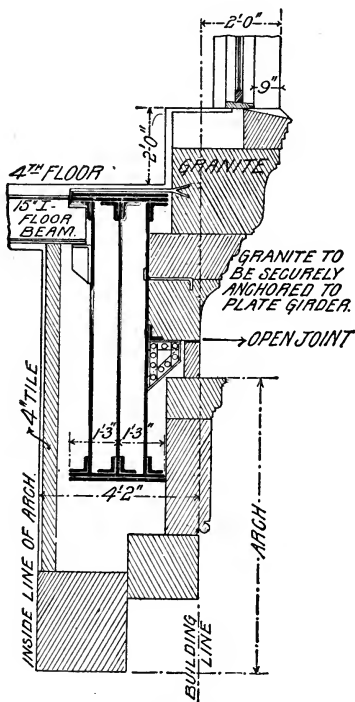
Section through Wall at Main Entrance to Masonic Temple.
